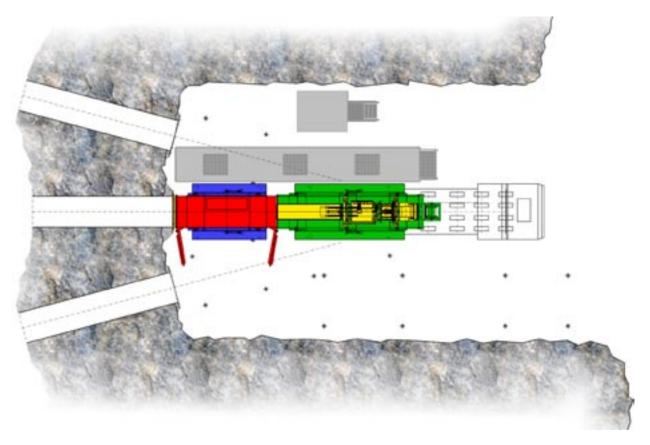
Plan view of demonstration site for KBS-3H at Äspö HRL
